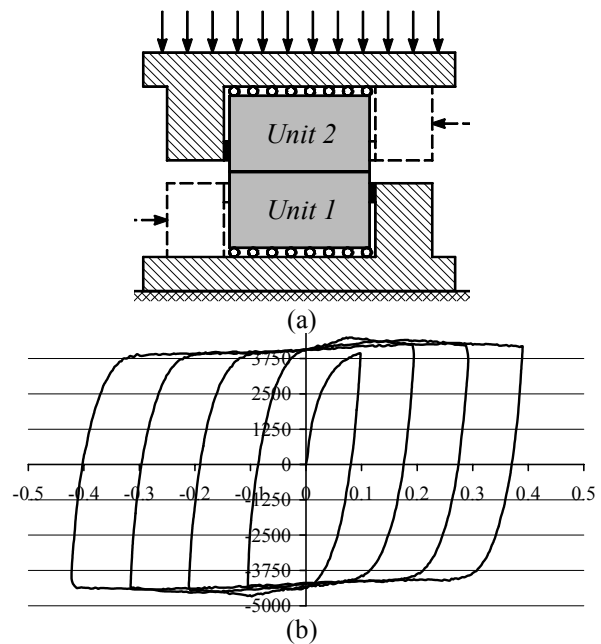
Shear testing of a dry masonry joint under cyclic loads: (a) test setup; (b) stress-elongation diagrams [5].
